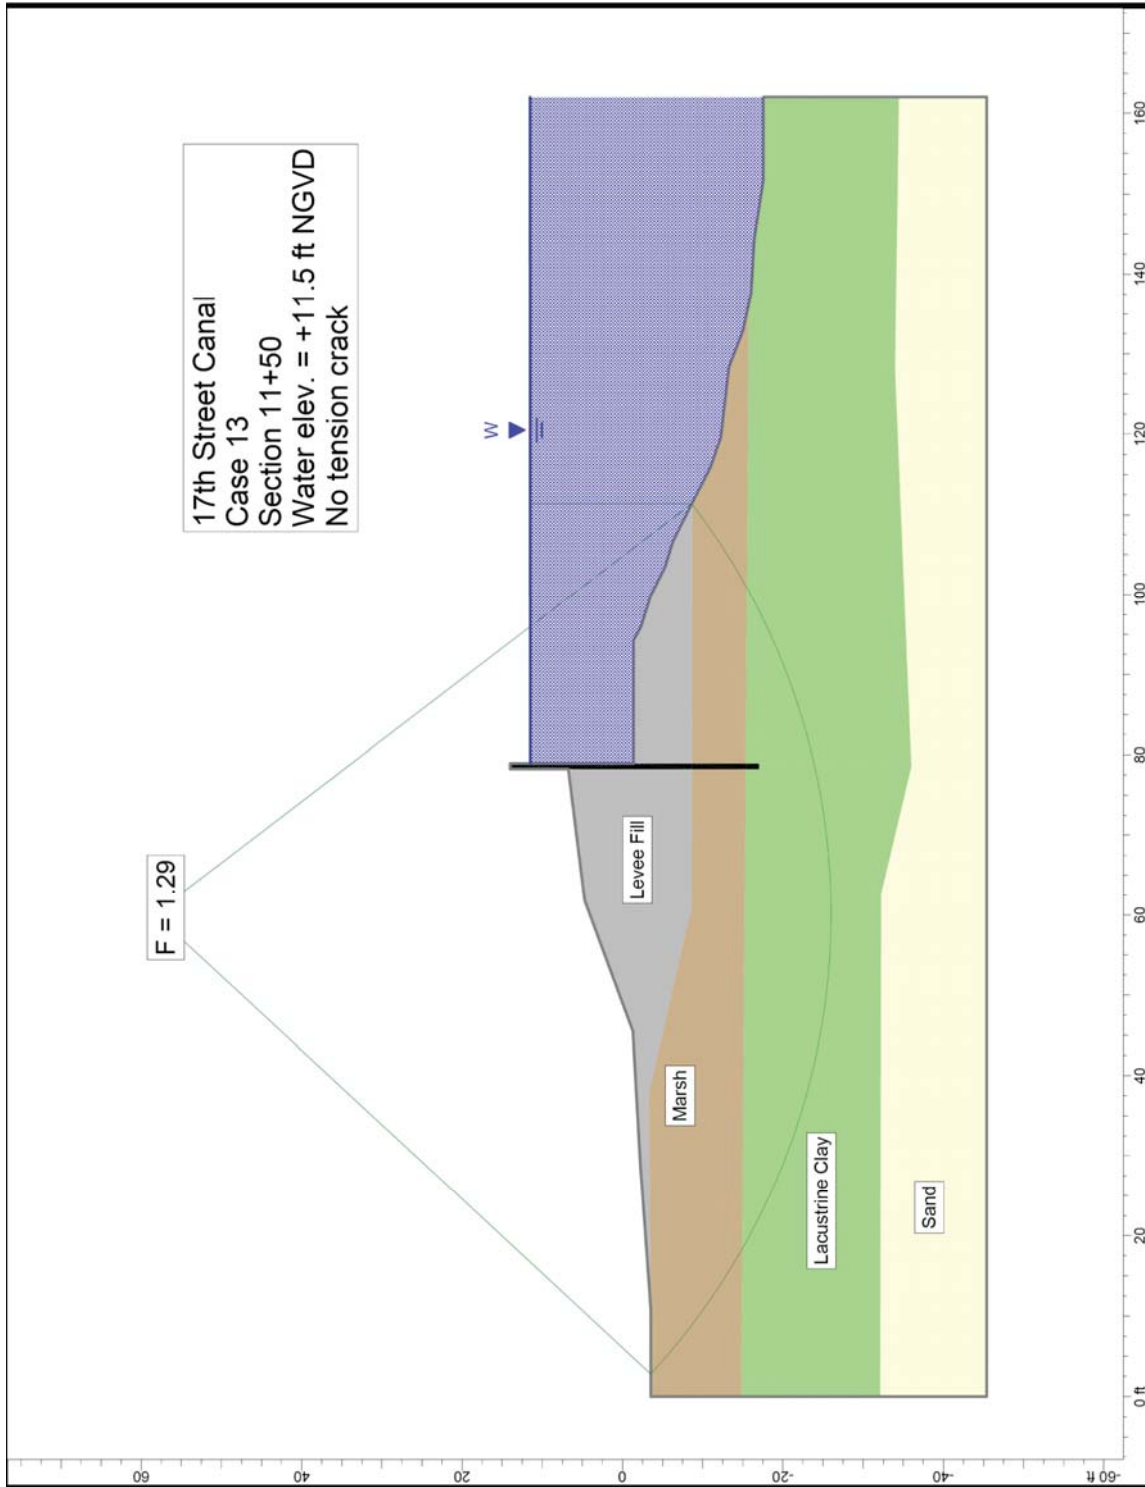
Critical circle for 17th Street Canal Station 11+50 – water elevation 11.5 ft, no tension crack.
